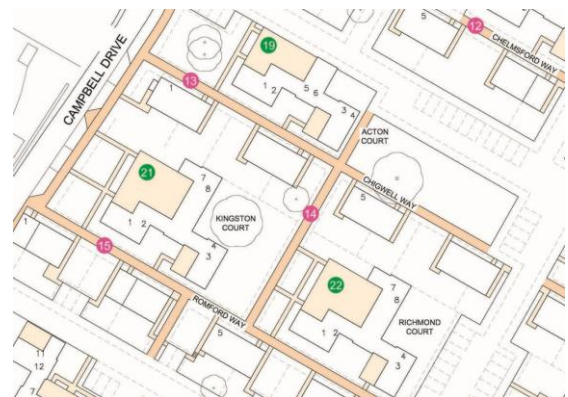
Environmental Improvements- Pathways Plan, Enlargement
